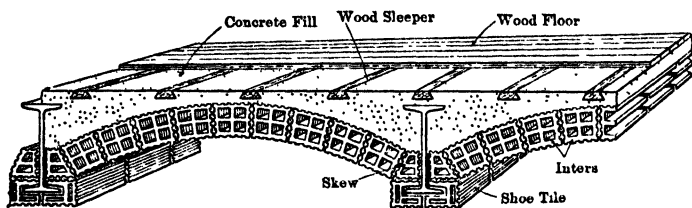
Segmental Floor-arch, Illustrating Method of Protecting Exposed Portions of Girder
